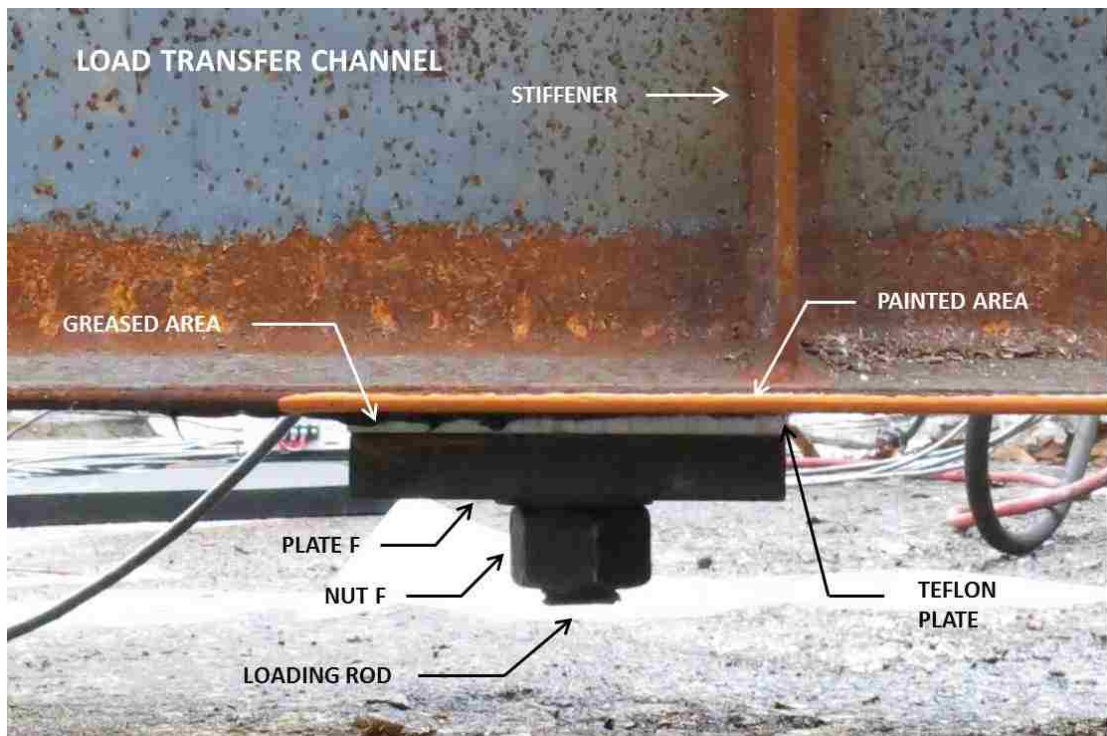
Loading rod assembly arrangement (Hampe, 2012)
